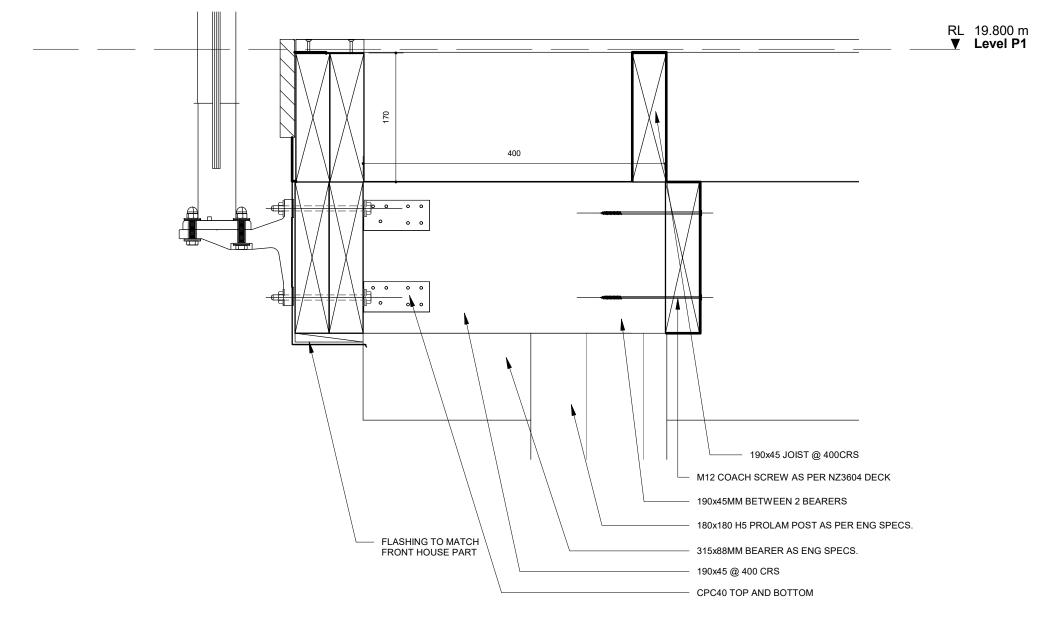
(c) - Face-fixed post support detail for cantilever balustrade (see 7.4.1.3)
